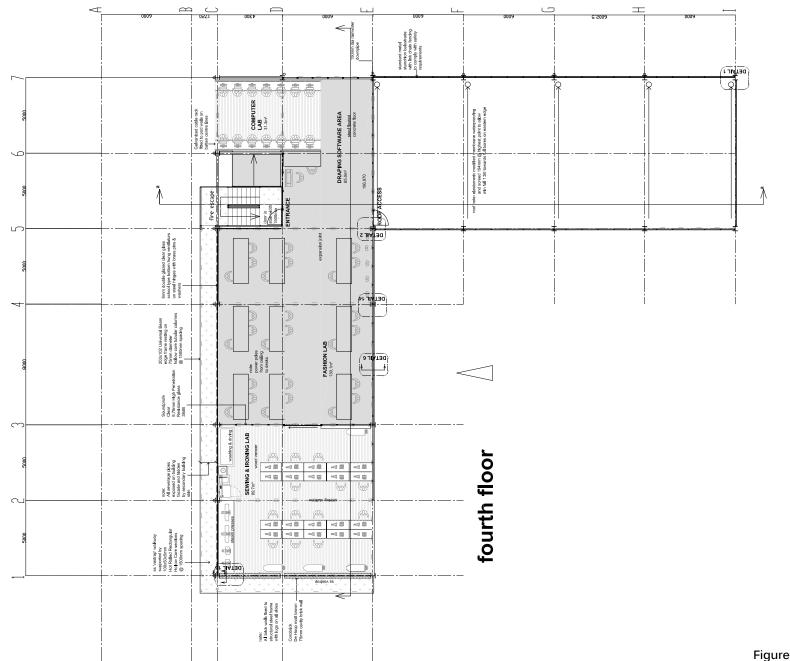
Fourth floor plan. Not to scale. (Stegmann, 2008)
